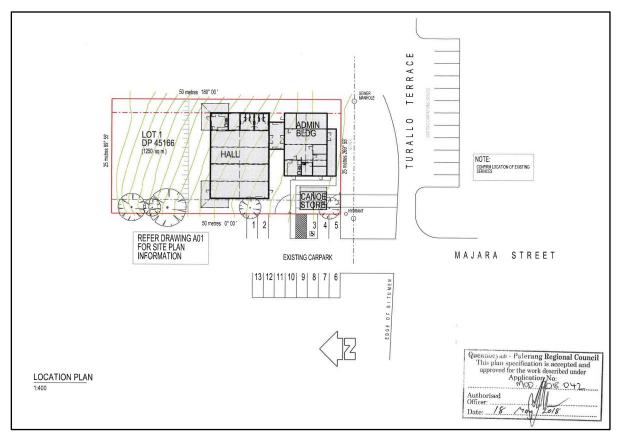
Scout Hall showing car parking in unformed Majara Street road reserve.
